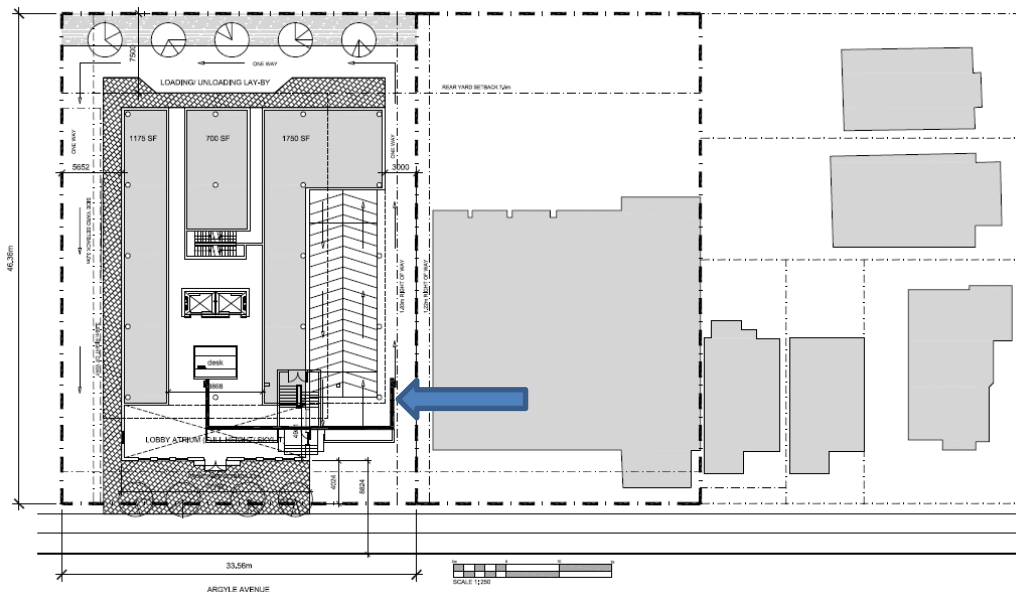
Plan view of the development site illustrating the building setback and the parking spaces. Soft landscape is limited to the front of the building and the sidewalk showing street trees. The main tower is setback behind the façade of the original building allowing it to continue to be interpreted as part of the streetscape. The dark line indicates the original location of the building.
